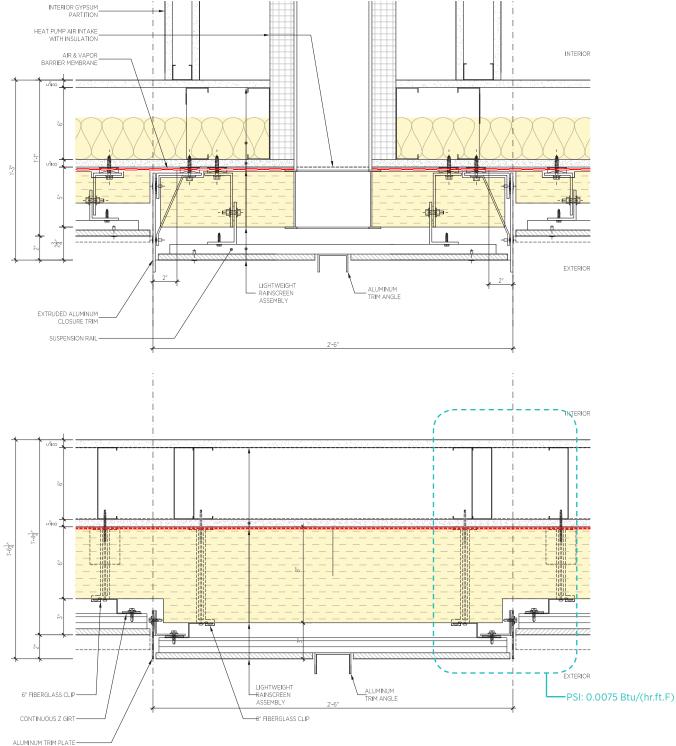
Base case Building - Lightweight rain screen at wall above & below window
